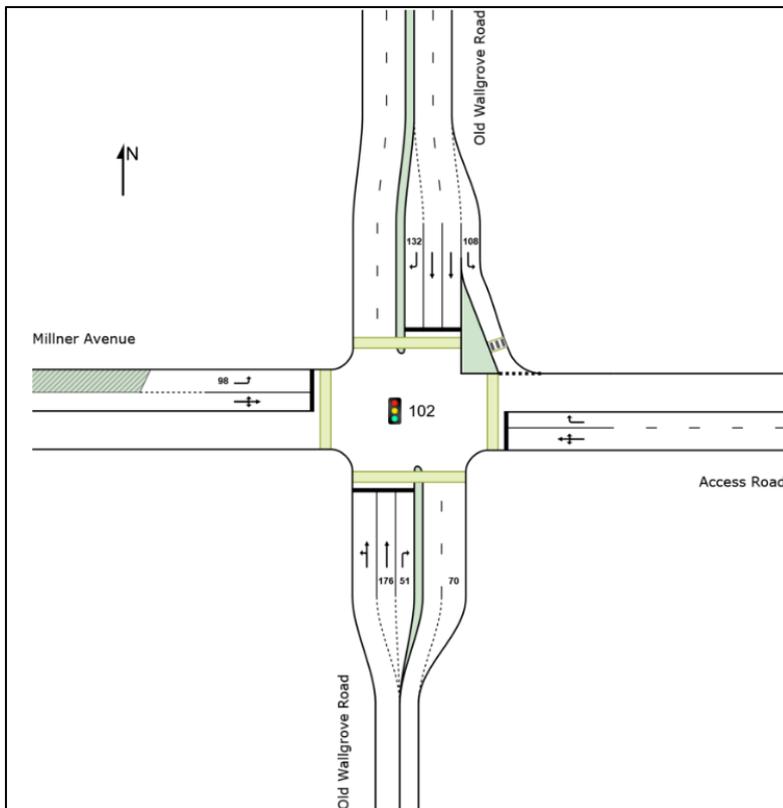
SIDRA Existing Intersection Layout – Millner Ave / Old Wallgrove Rd
